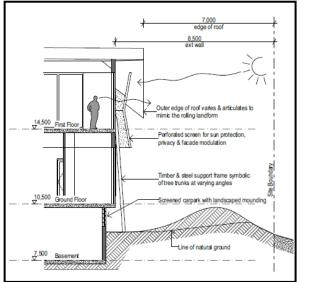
Proposed earth mound adjacent to Ewingsdale Road
